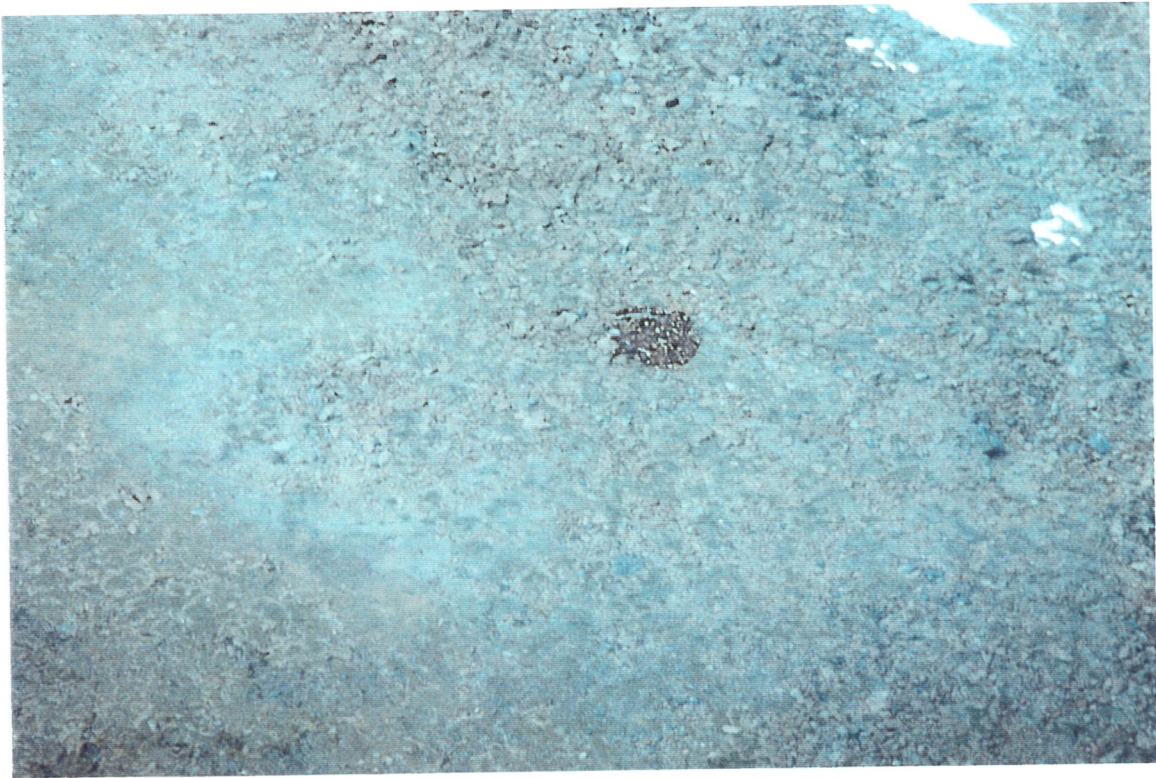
Third class site : ten (10) drilling pipes (Site #10)
